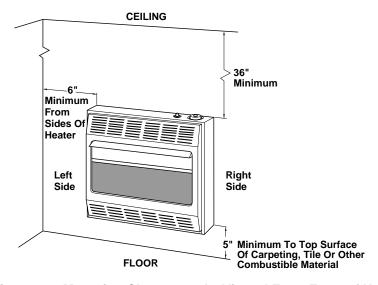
Mounting Clearances As Viewed From Front of Heater
